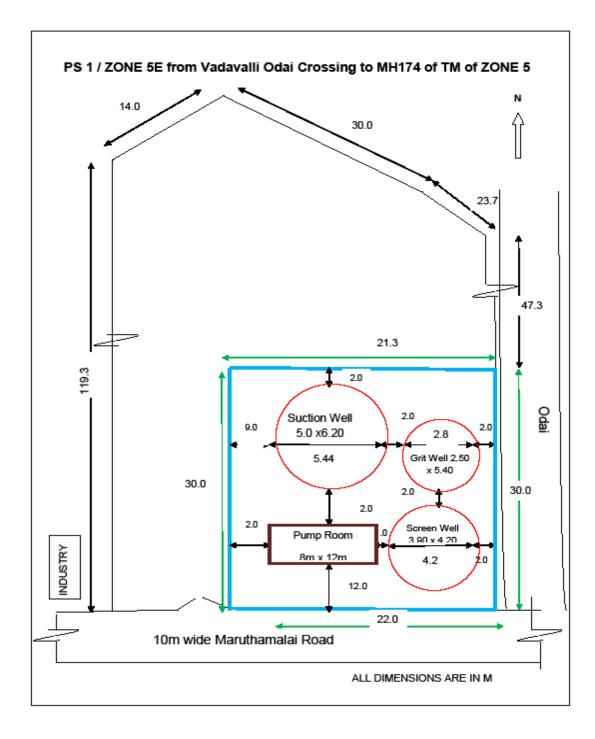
Site Set out Plans – Zone V (Vadavalli Stream Crossing)
